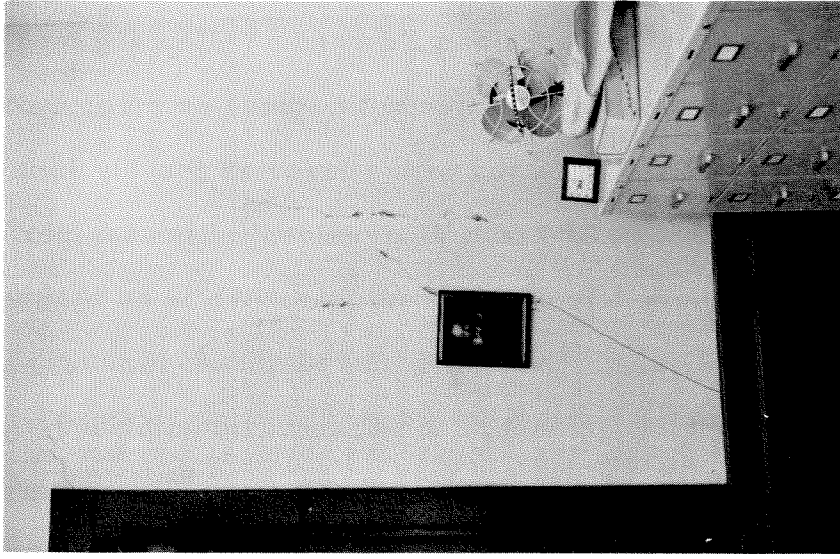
Hollow tile filler walls were cracked in old buildings as far away as Pasadena. Throop Hall, California Institute of Technology.
